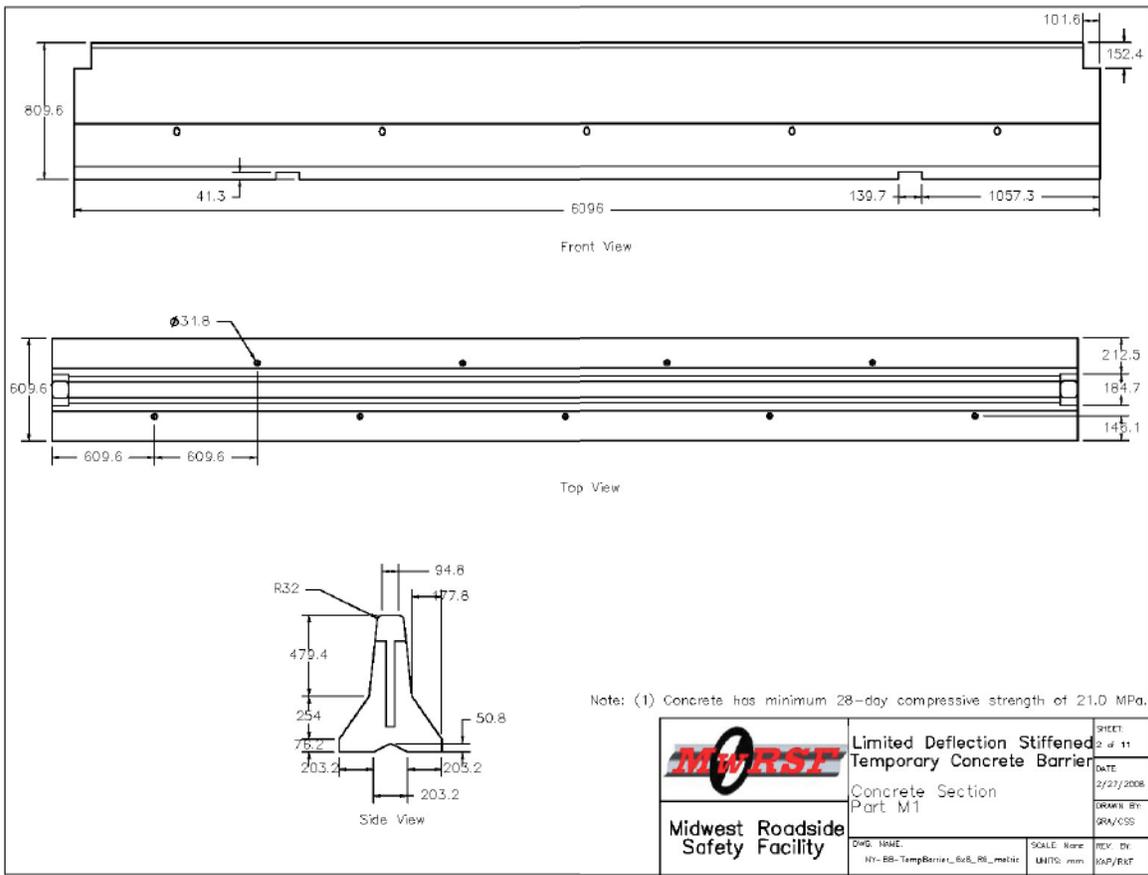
Temporary Concrete Barrier Details, Test NYTCB-3
